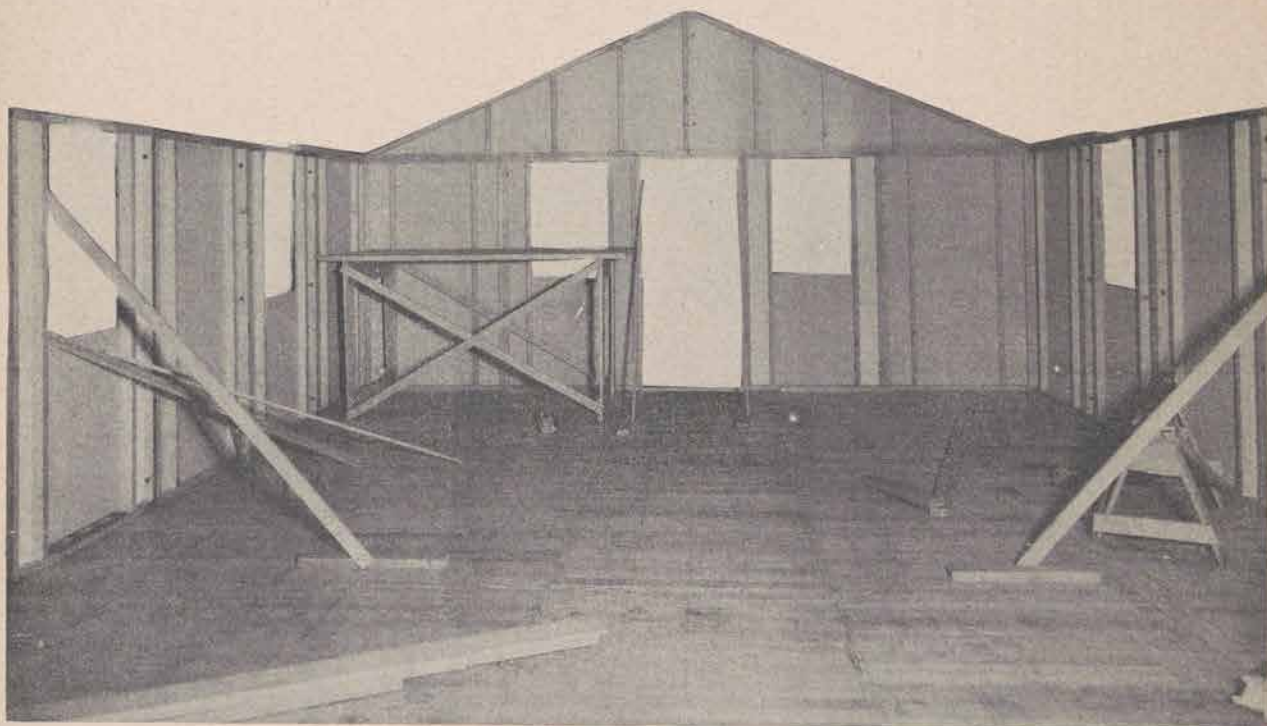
End gables and side wall panels completely erected and ready for roof panels.
